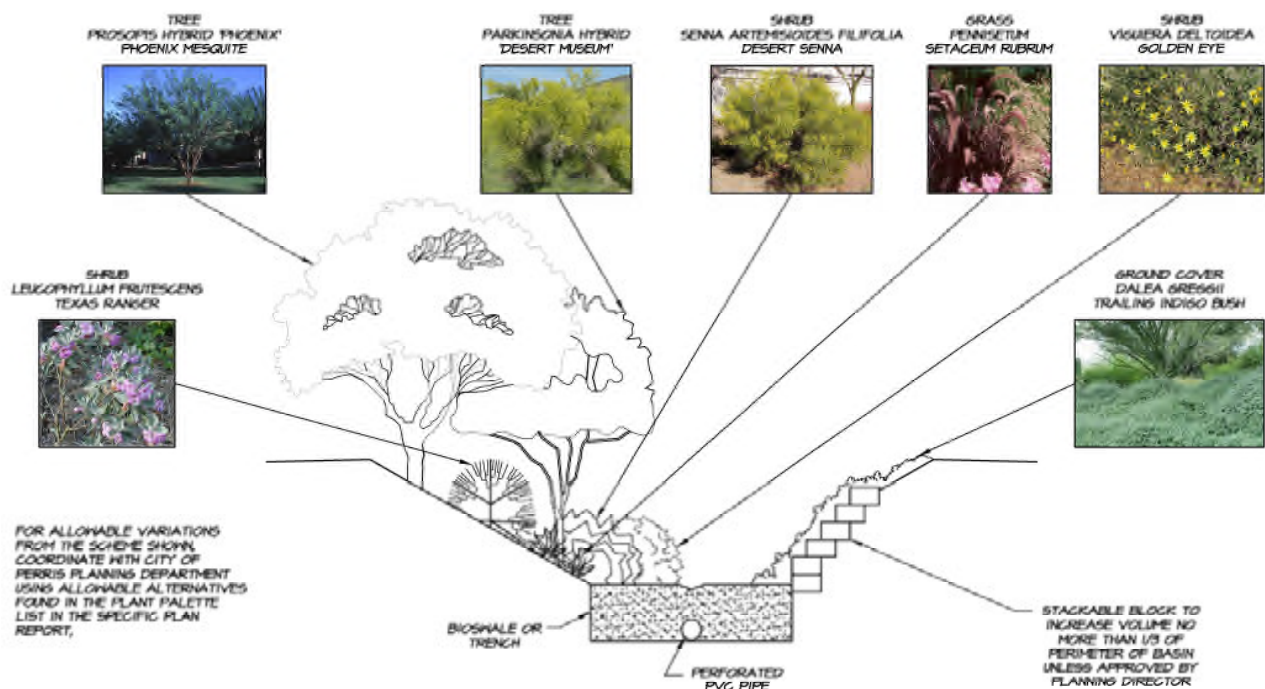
FILTER TRENCH DETAIL 12-FOOT PARKWAY
